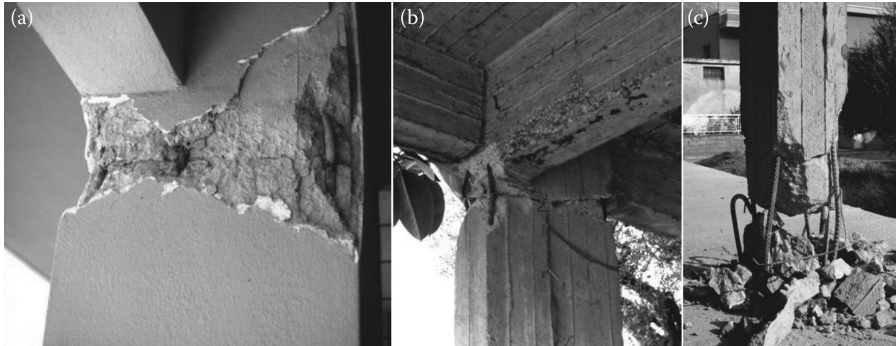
Flexural damage (a) or failure (b, c) at column ends.
